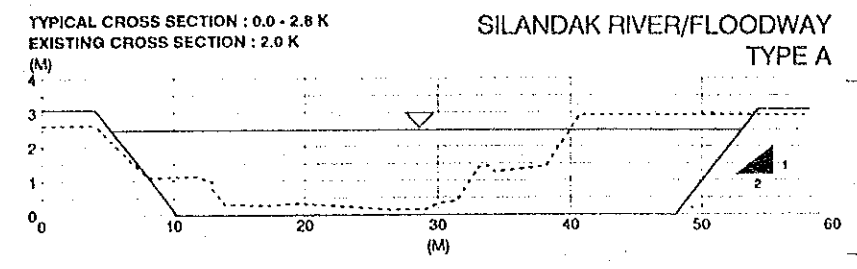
(1/4) PROPOSED TYPICAL CROSS SECTION FOR
